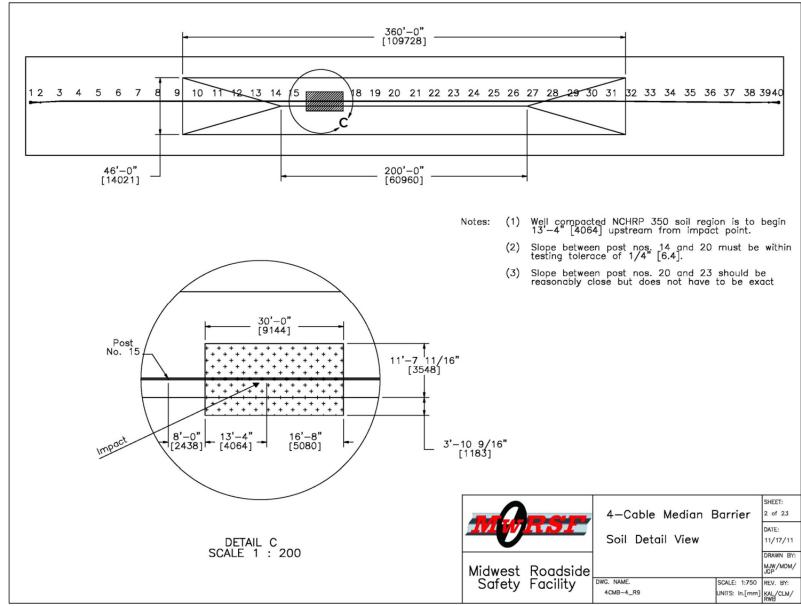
Soil Compaction Layout, Test No. 4CMB-4
